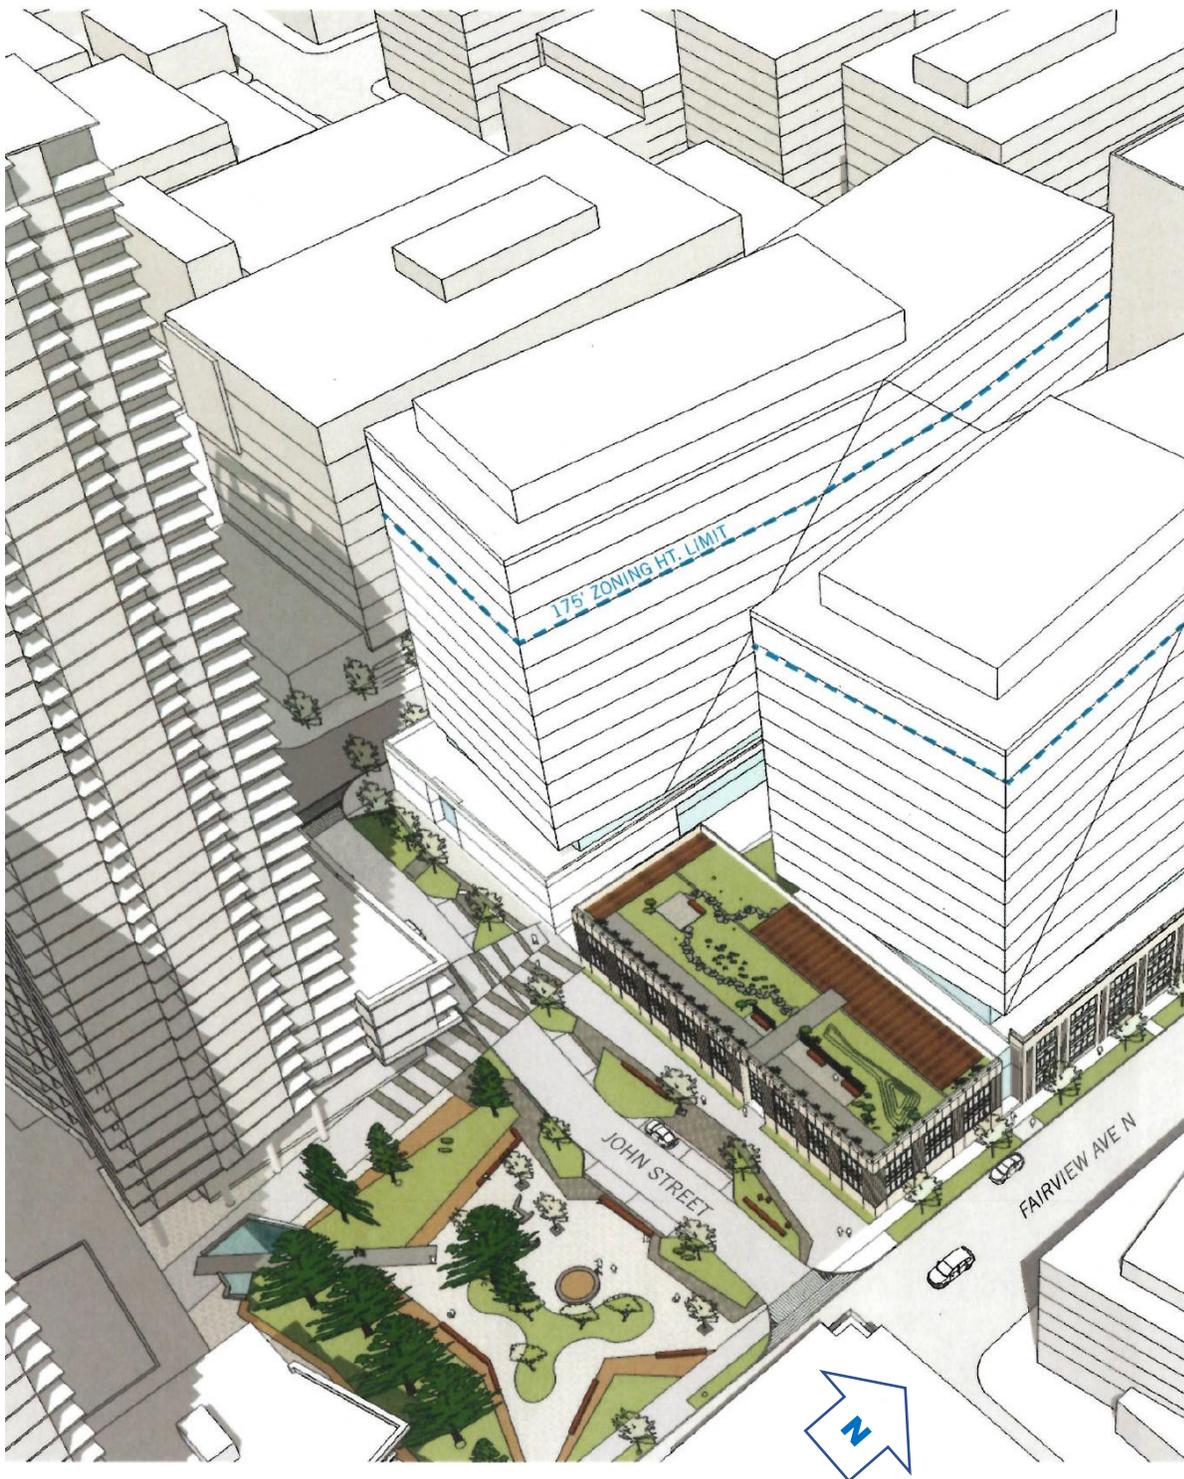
This diagram shows the Seattle Times Park at the northeast corner of John Street and Fairview Avenue N. The buildings across John Street from the park are proposed commercial towers with floor area transferred from the park.
